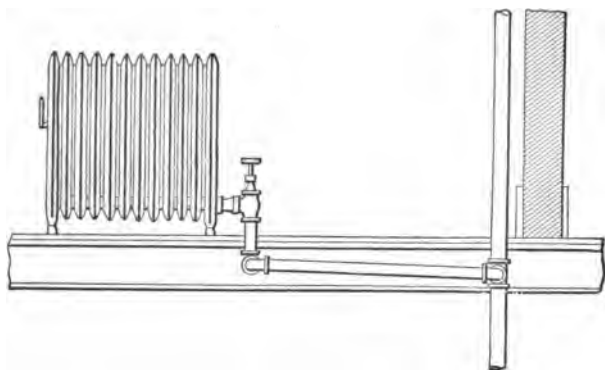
Elevation, One-Pipe Radiator Connection
